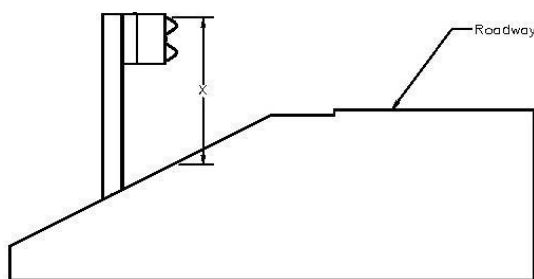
Guardrail Height Measured to the Ground at Rail Face
